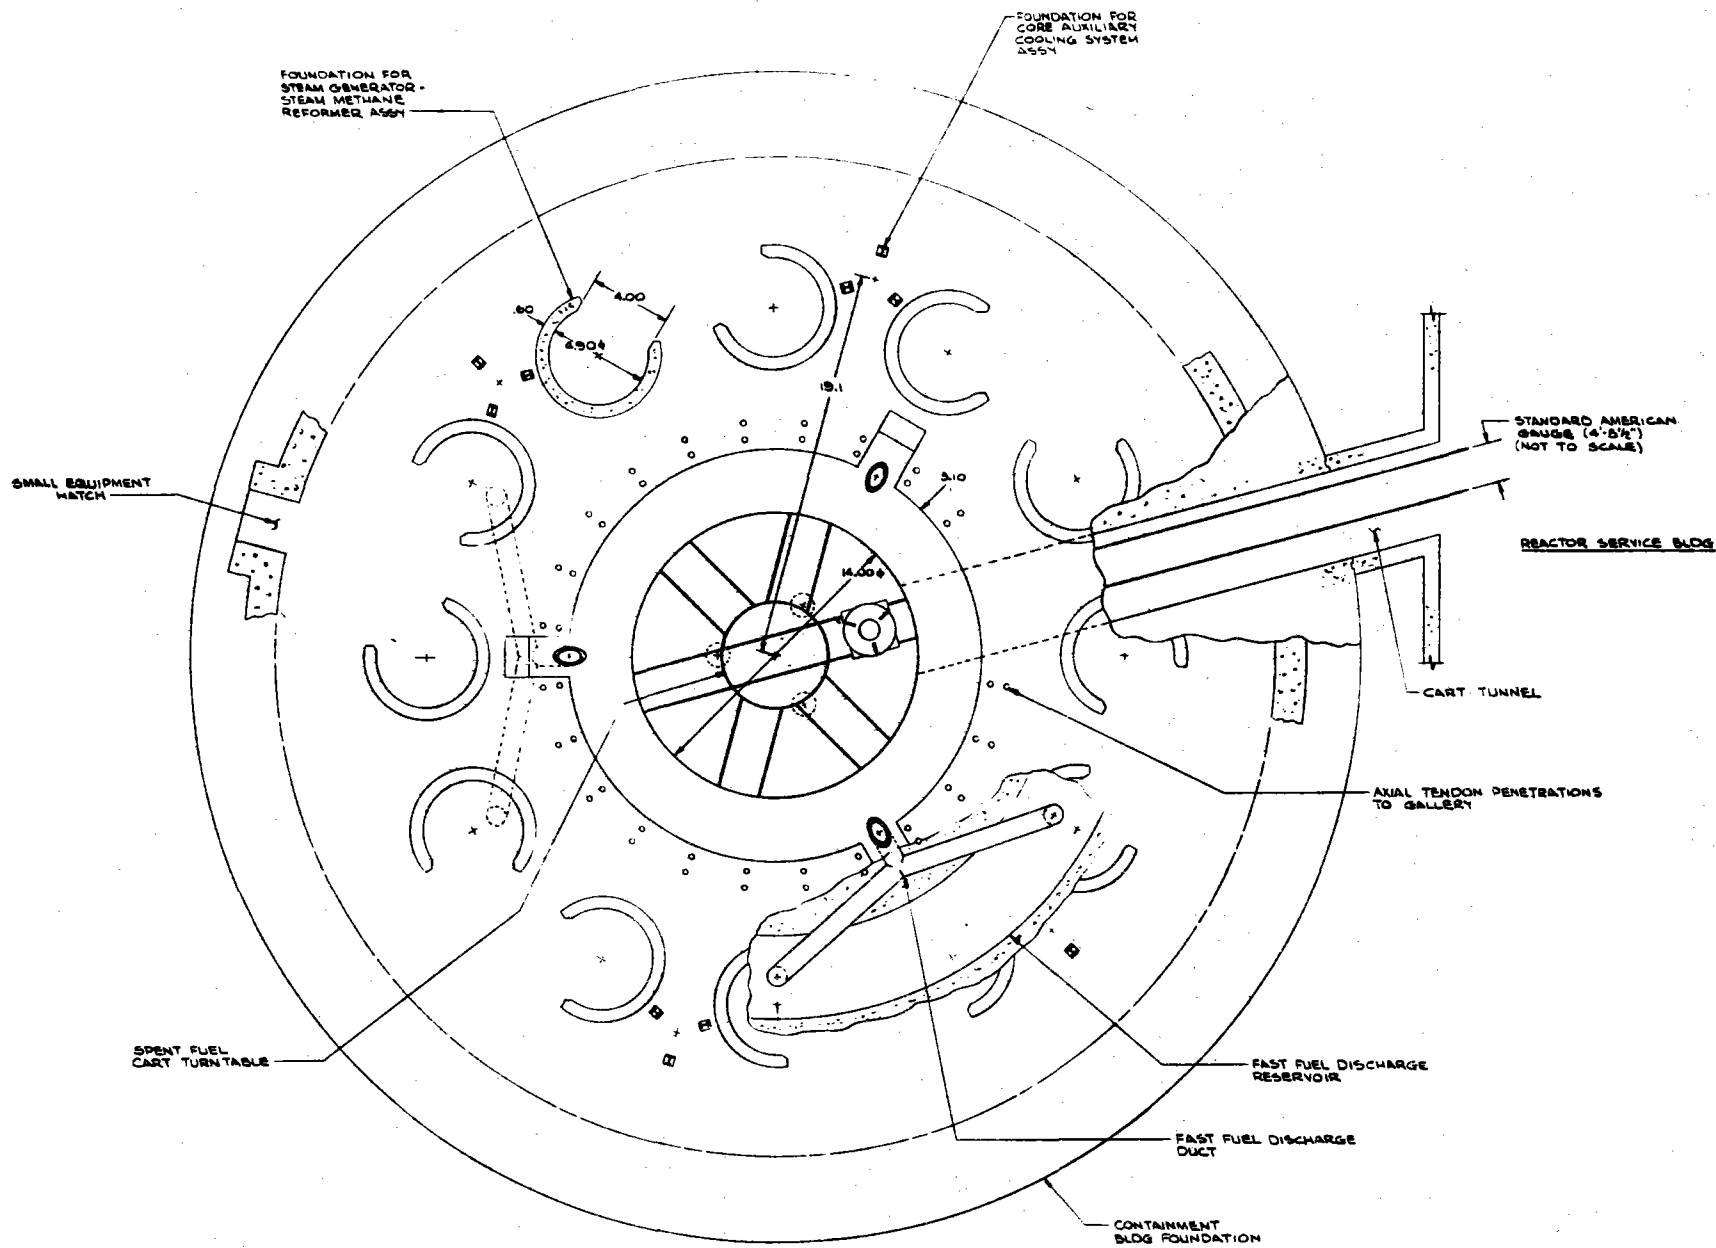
Plan View of the Foundation for the PCRV and Containment Building.
